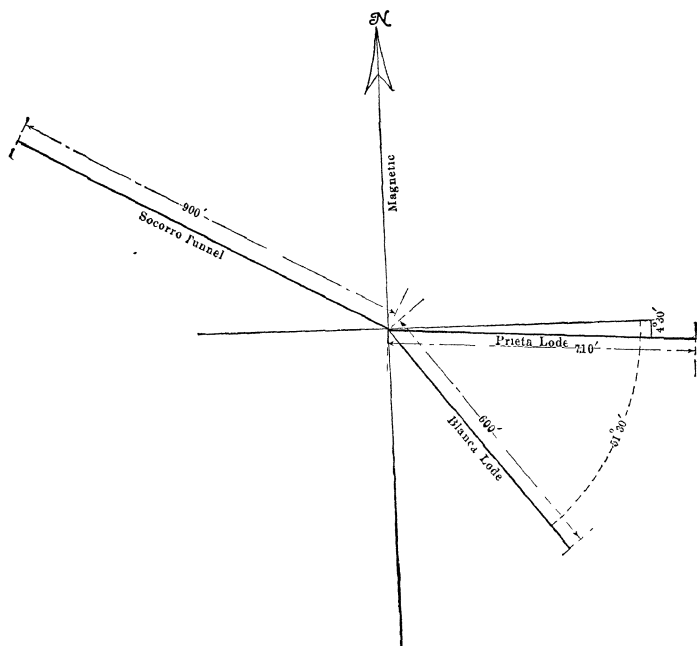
PLAN; SHOWING BEARINGS OF BLANCA AND PRIETA LODES, AND SOCORRO TUNNEL.
